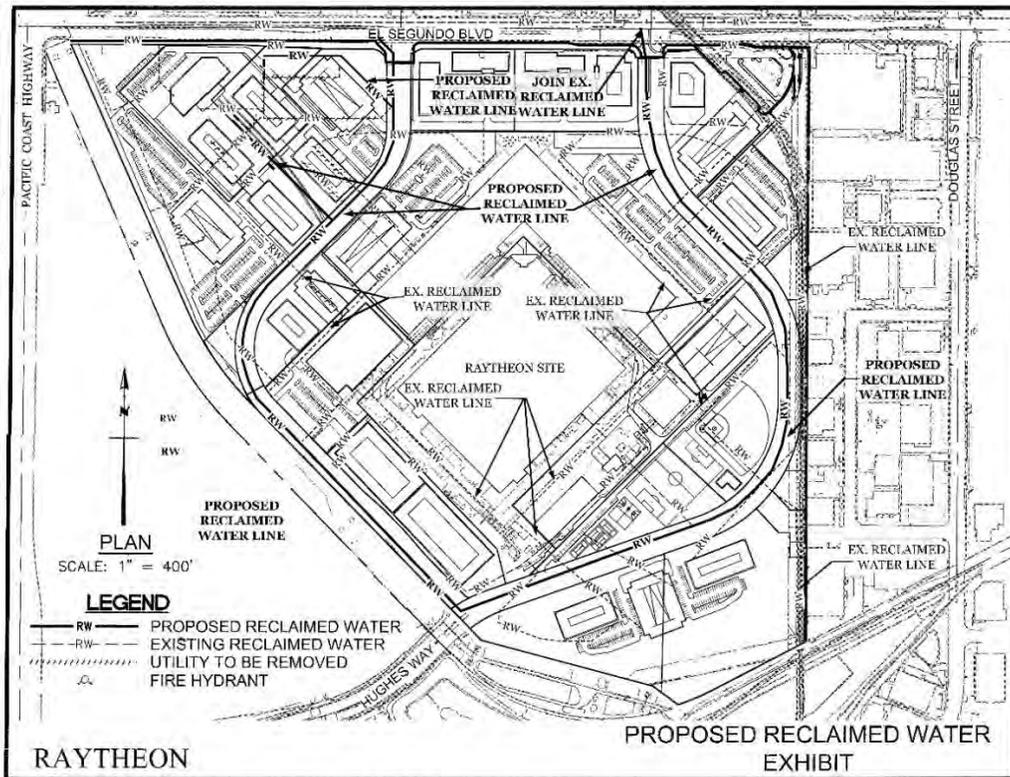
CONCEPTUAL RECLAIMED WATER PLAN
